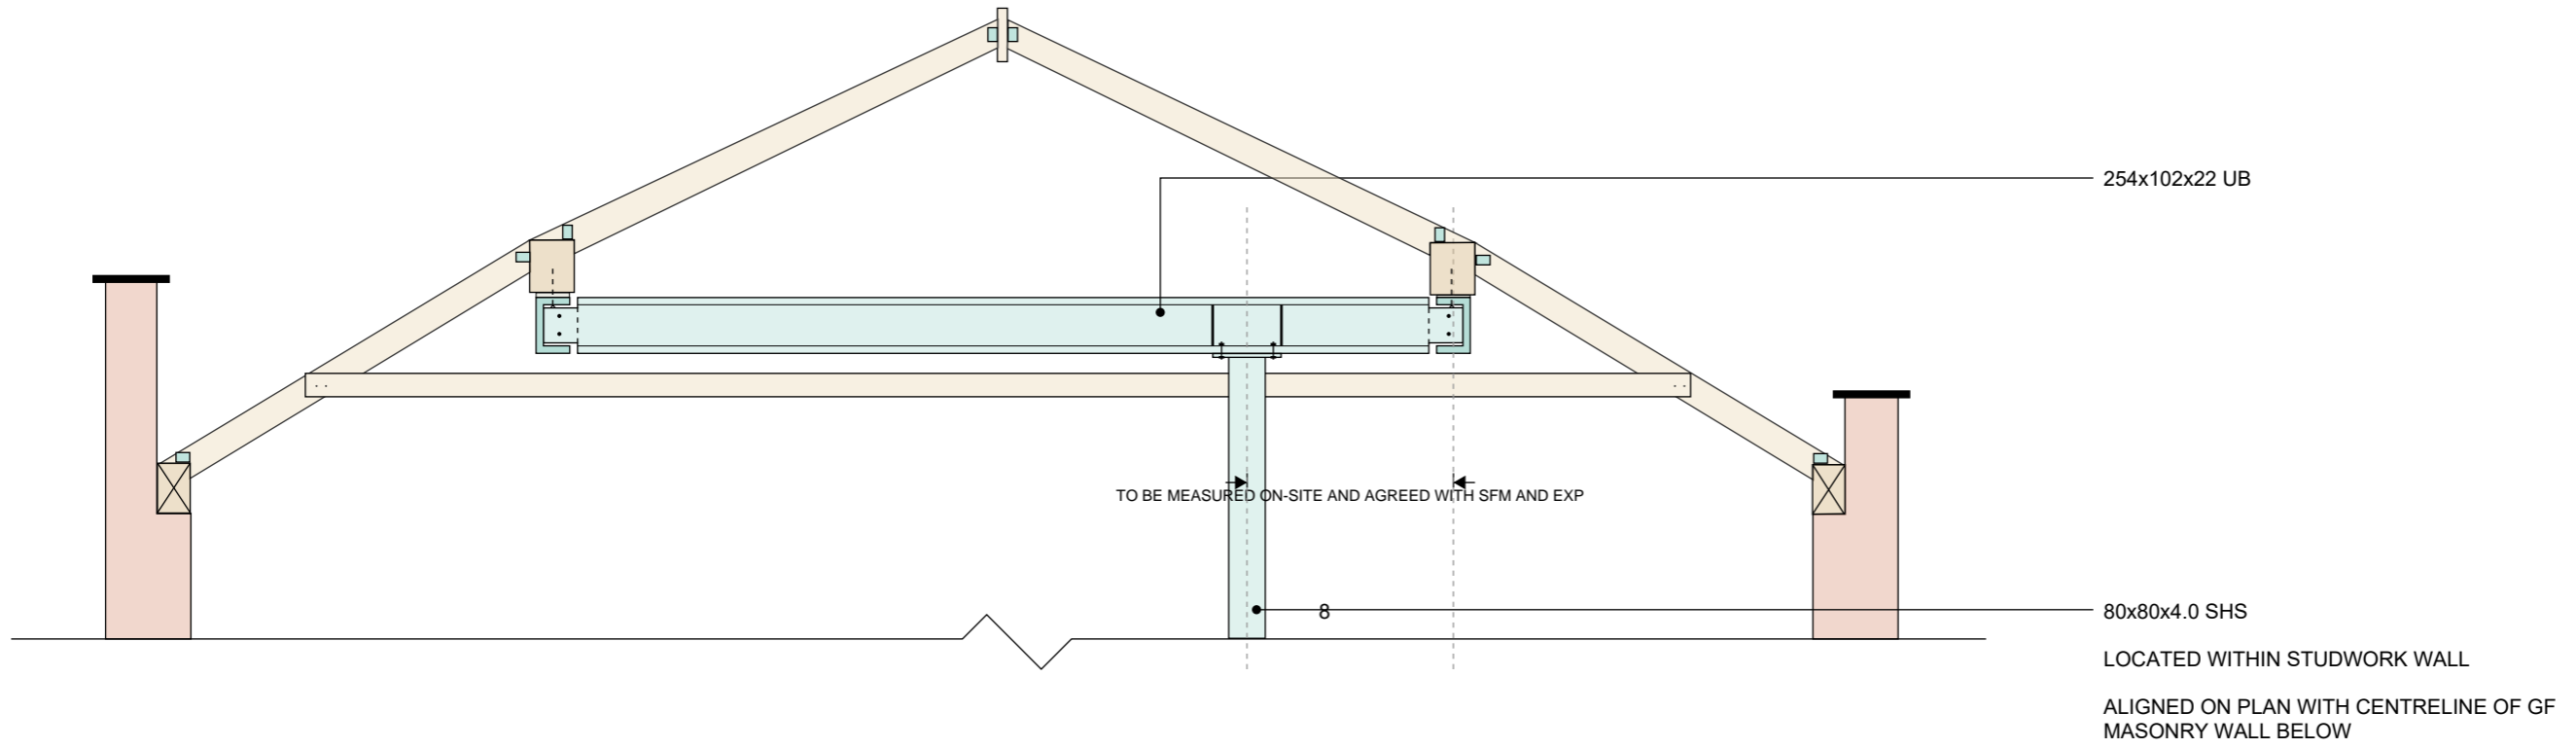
SADDLE BEAM SUPPORT TO PURLIN
